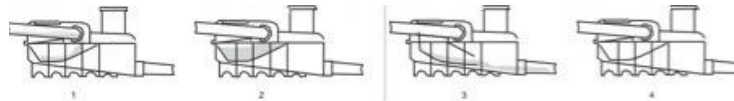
Drainwave temporarily retains small amounts of water and when the collector is full the Drainwave tips by gravity and sends a pulse wave through the drainage pipes.
